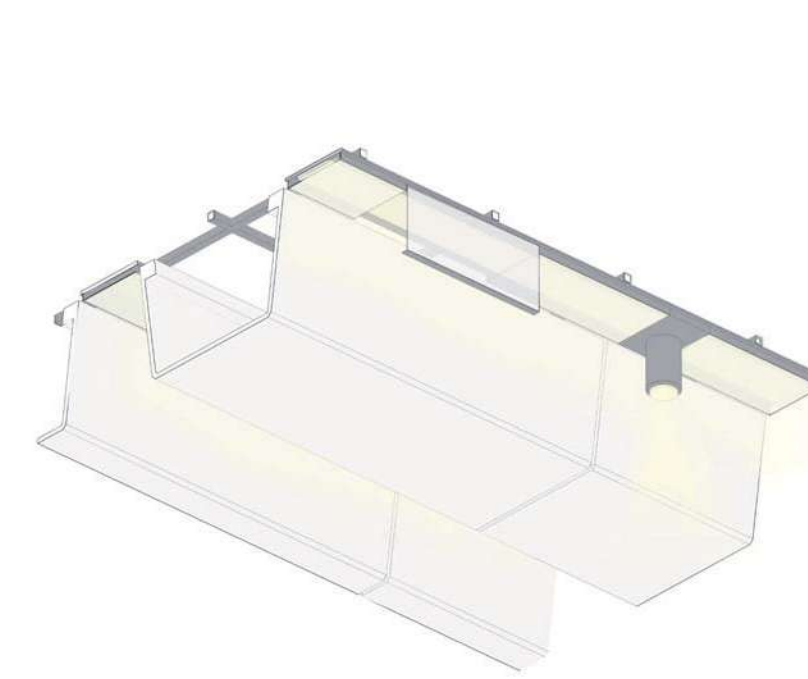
Lightbox and spotlight diagram to U-beam cladding
